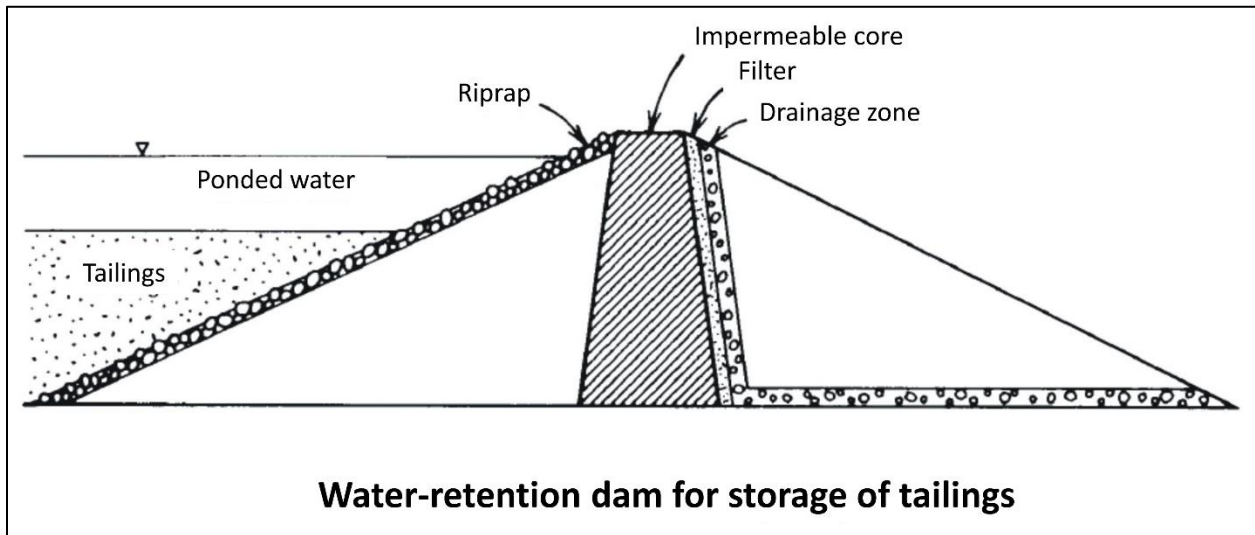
Tailings dams and earthen water-retention dams are fundamentally different civil engineering structures. Vick (1990) showed how a tailings dam could be constructed in the same way as a water-retention dam and that it would be as safe as a typical water-retention dam. The design includes an impermeable core and a drainage zone to lower the water table at the toe of the dam, and a filter to prevent internal erosion (transport of solid particles out of the dam by seepage). However, the design would not be economically feasible for a tailings dam. Figure modified from Vick (1990).
